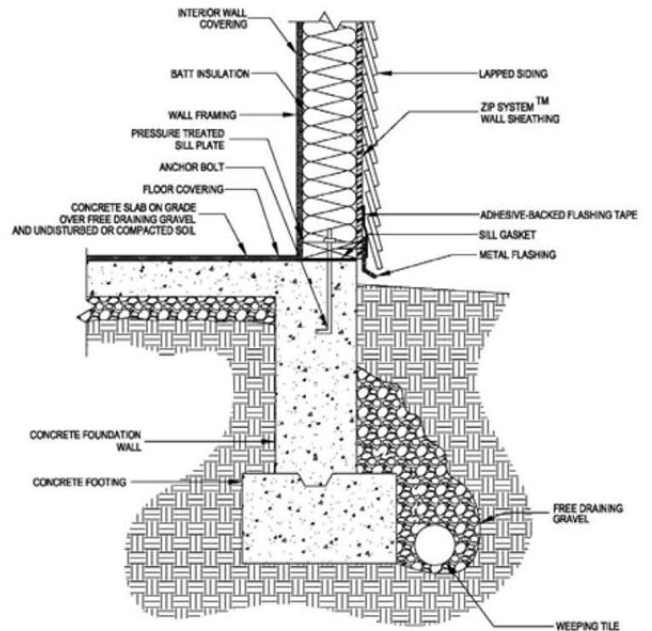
TYPICAL WALL-SILL INTERSECTION AND FLASHING DETAILS FOR LAPPED SIDING
